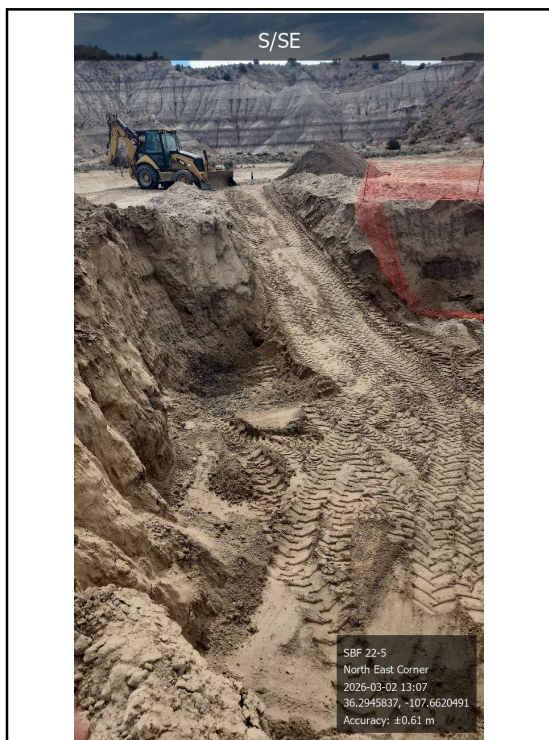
Looking south-southeast at the final southeast wall, ramp, and base of the excavation.
